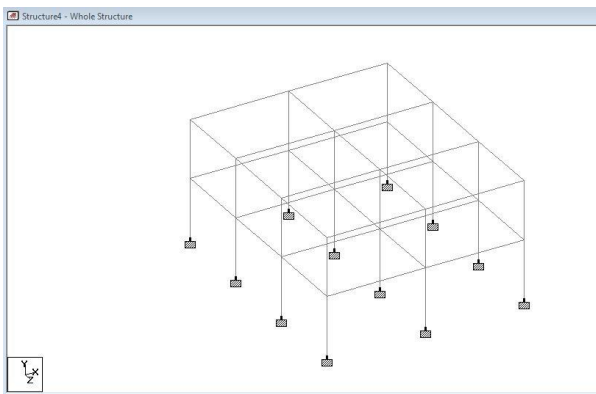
CASE-IV OF PARTIAL CONSTRUCTION FRAME [Building constructed up to second floor]
